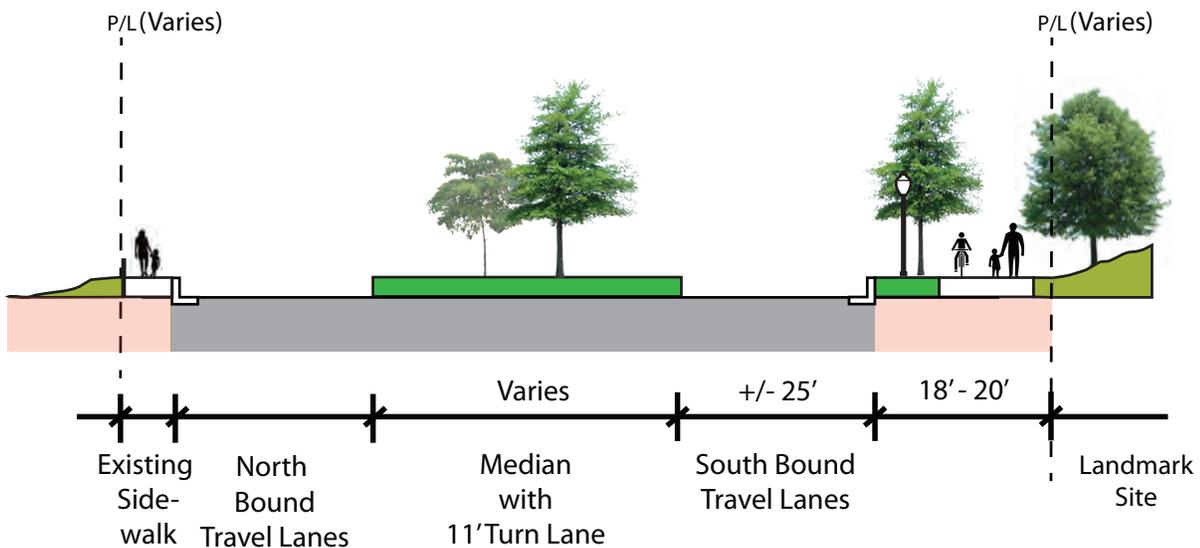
Van Dorn Street Cross Section - Commercial Connector (See Note 1 & 2)
